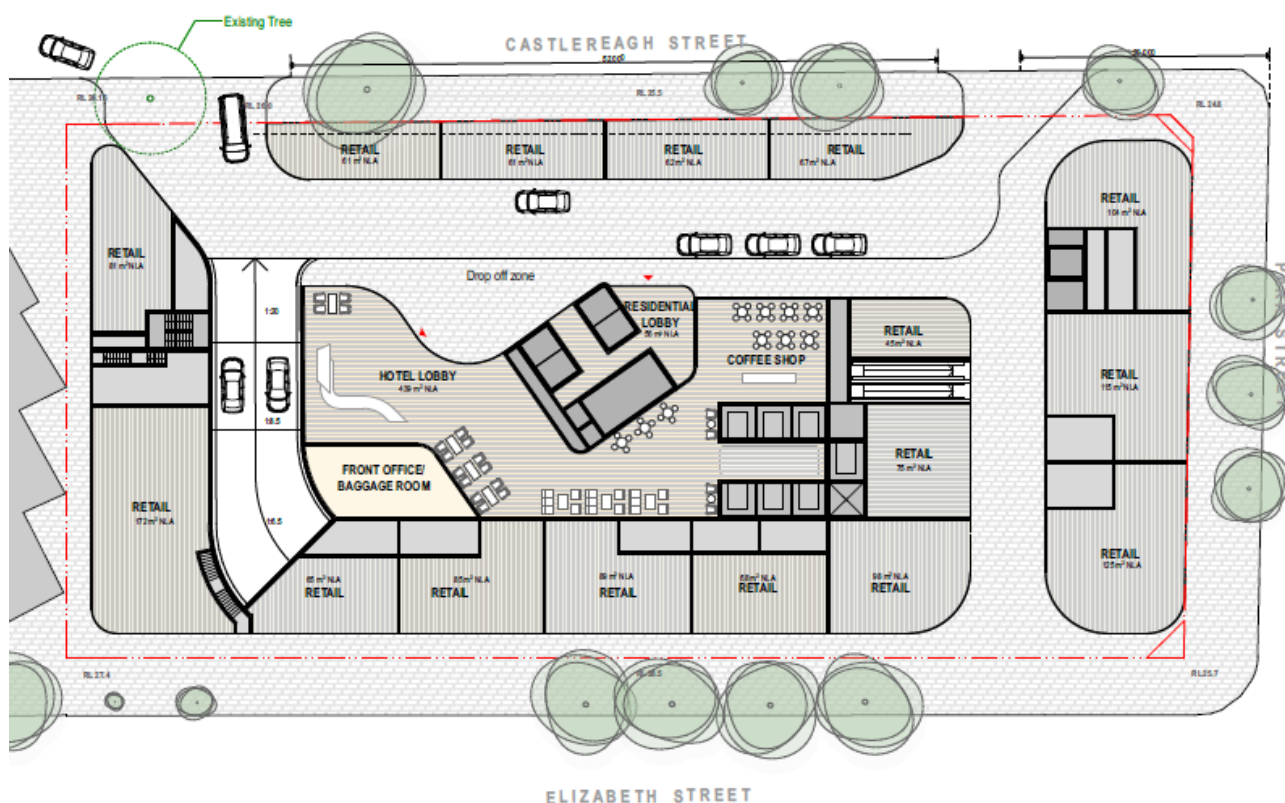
Proposed site access arrangements subject to deferred commencement condition 1
